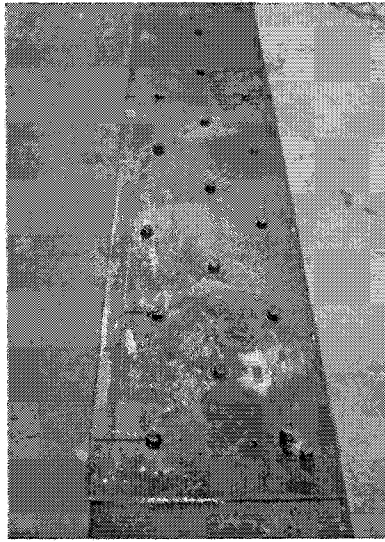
Anchoring of the steel plate of beam F-ST-1 using steel screws
